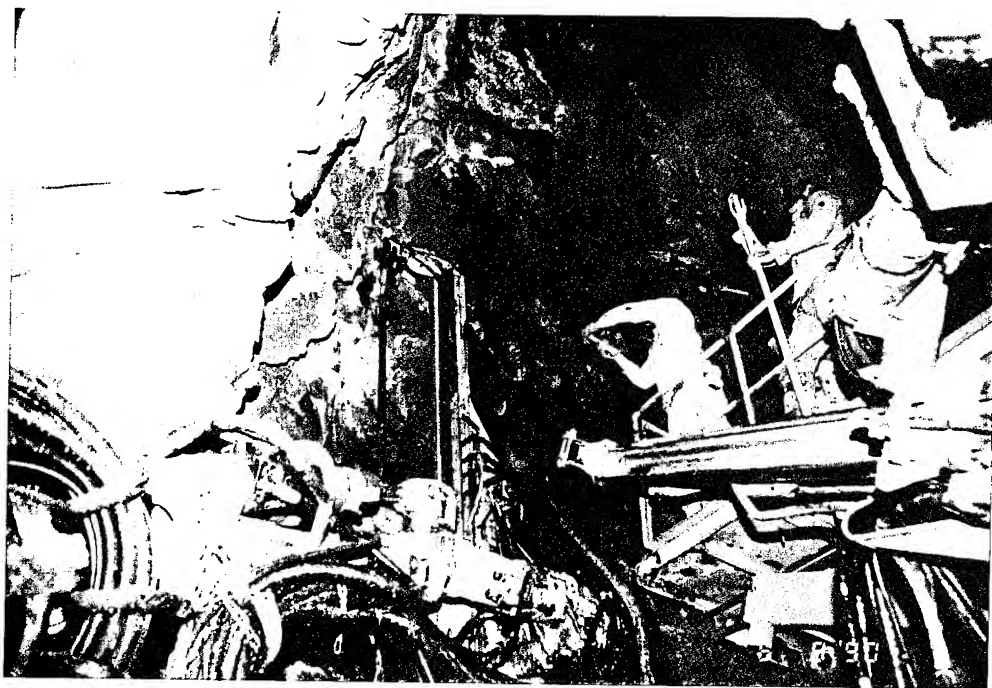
Miners loading two part resin grout (celtile) in ECC anchor hole.
